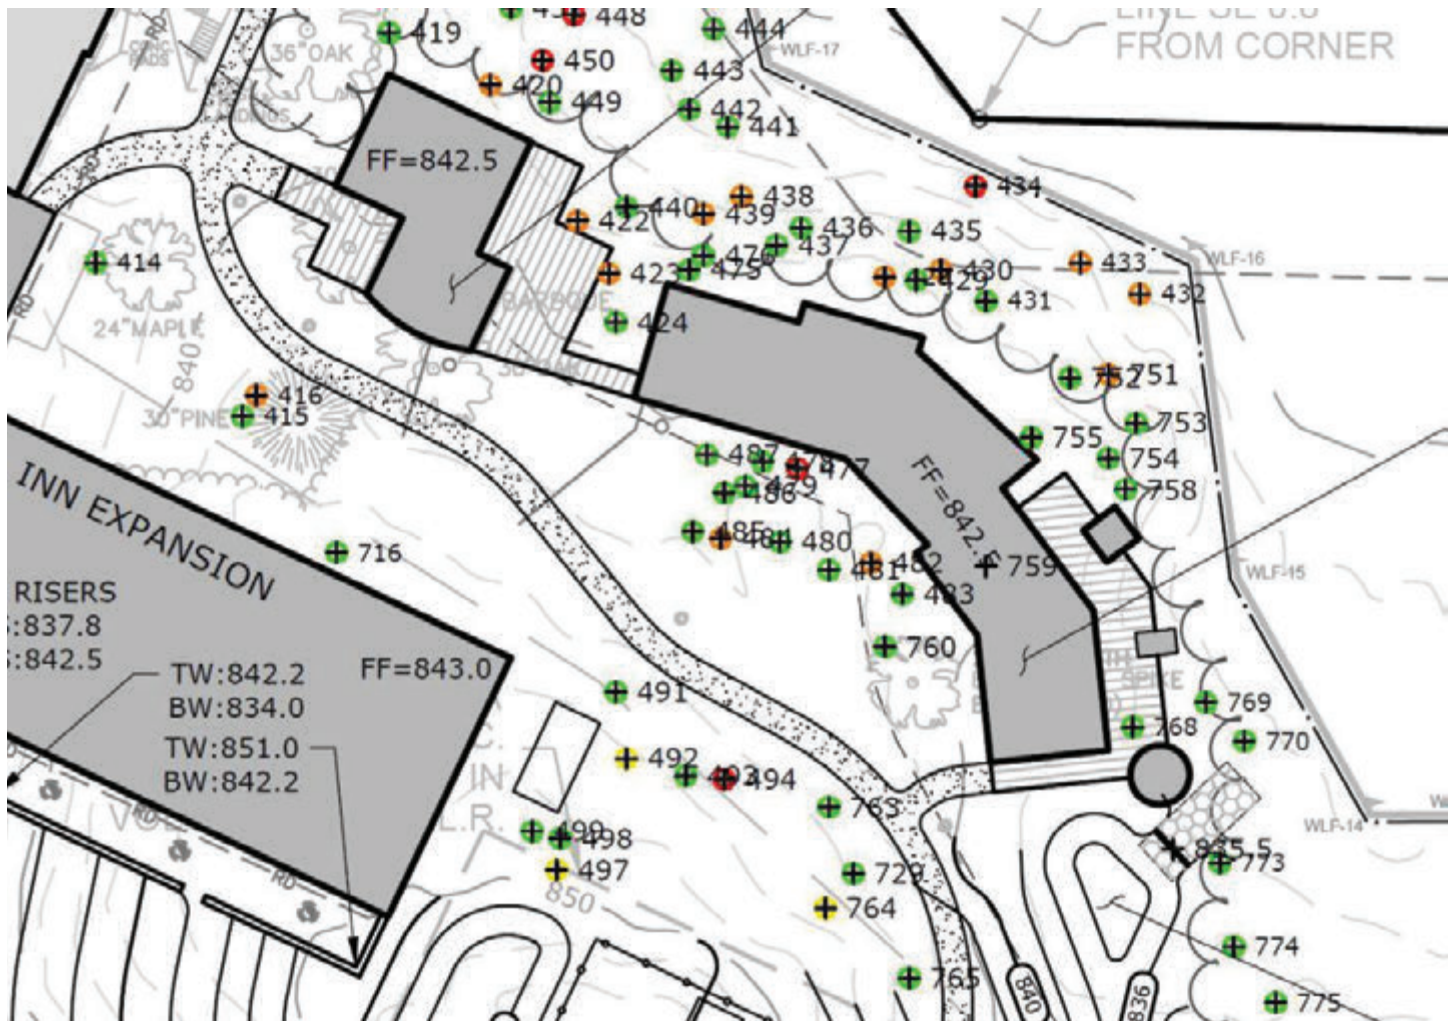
of area surrounding West building. A deliberate access or mobilization plan will be required here to limit the disturbance to surrounding trees along with the installation of trunk protection where working in close proximity to remaining trees. As with the trees surrounding the cabins, care must be taken to limit root impacts with the installation of a fence at the limits of construction and to protect the soil from excessive compaction.
